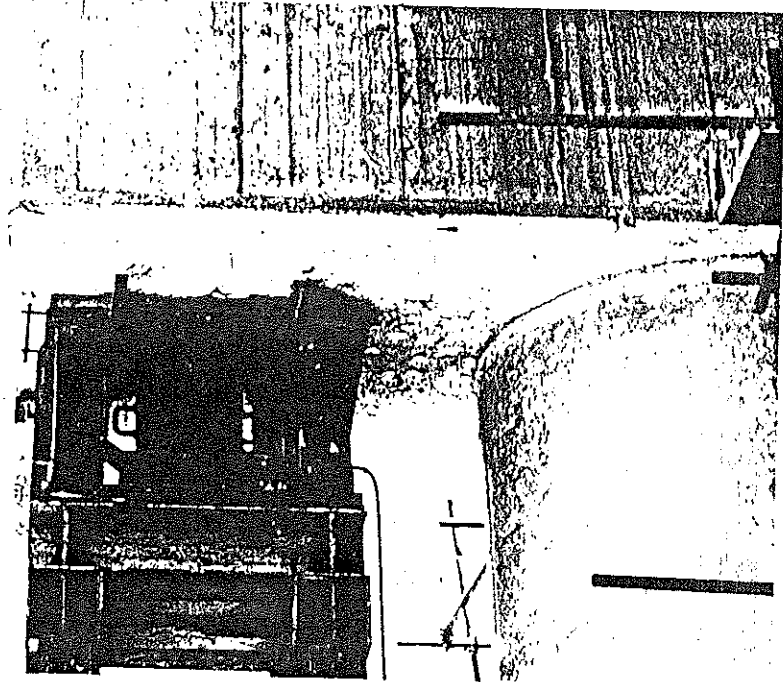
JACK STILL IN POSITION BUT PRESSURE IS RELEASED
